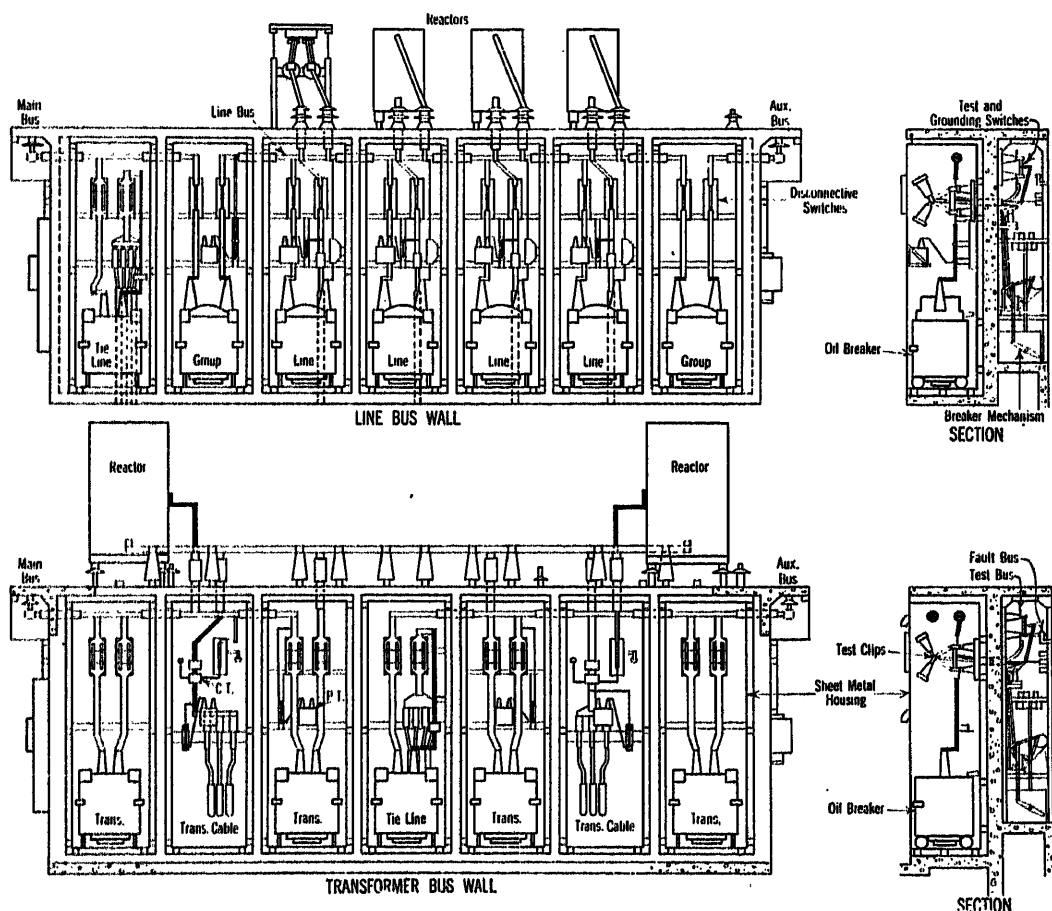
ELEVATIONS AND SECTIONS OF ONE PHASE OF 12-KV. INSTALLATION IN SHEET METAL HOUSINGS
